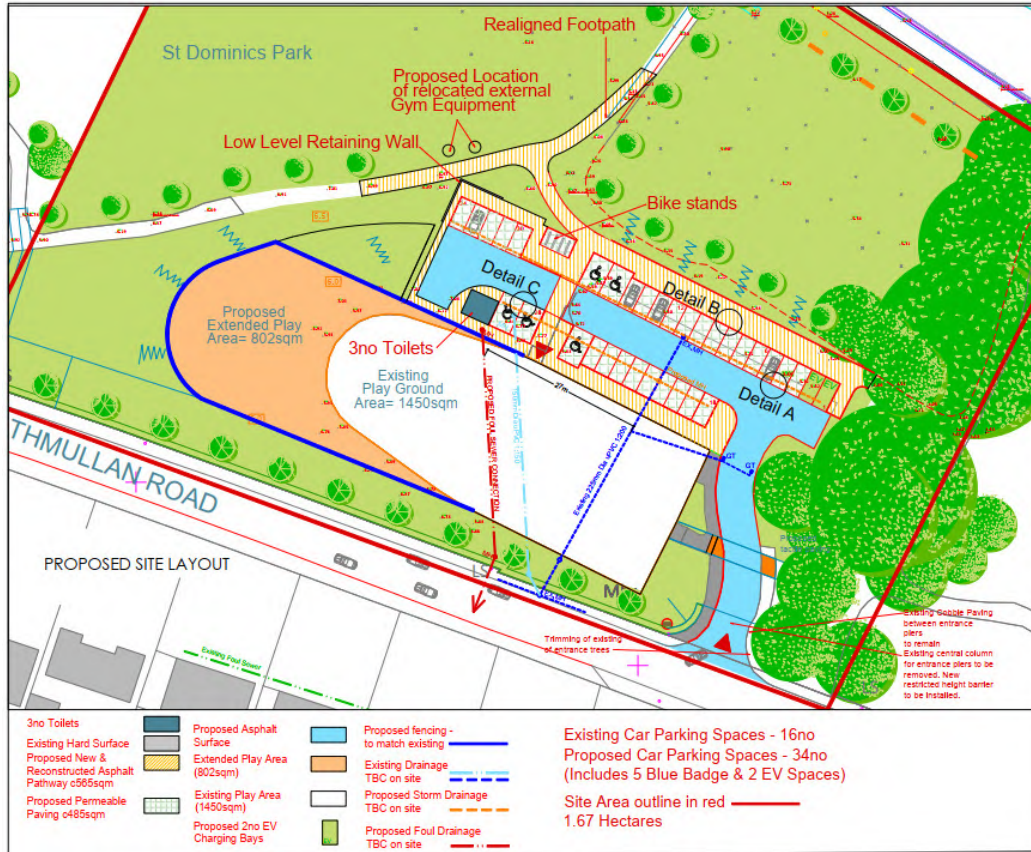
Proposed Alterations of Existing SW Drainage Network to provide an emergency overflow route (Schematic only) and Proposed Foulwater Drainage network to discharge to Combined Municipal Foulwater sewer on Rathmullan Road.
